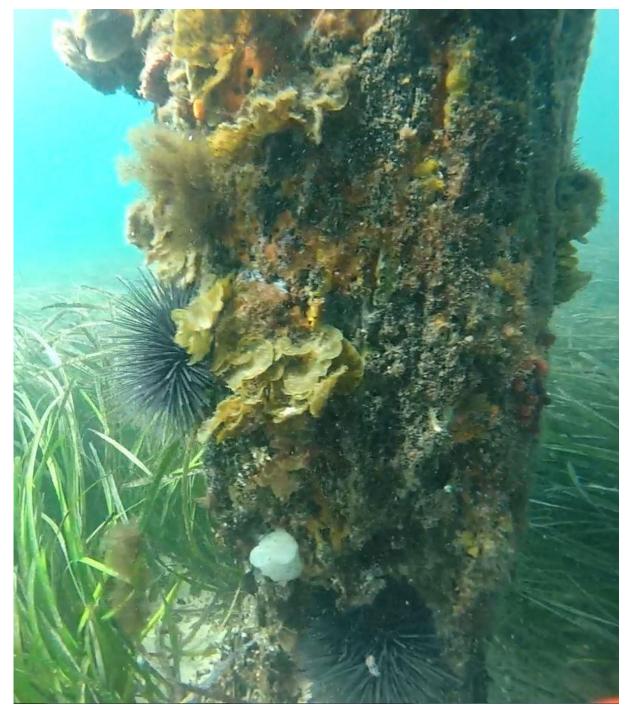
66 North 11/11/15 – Severe section loss at base
